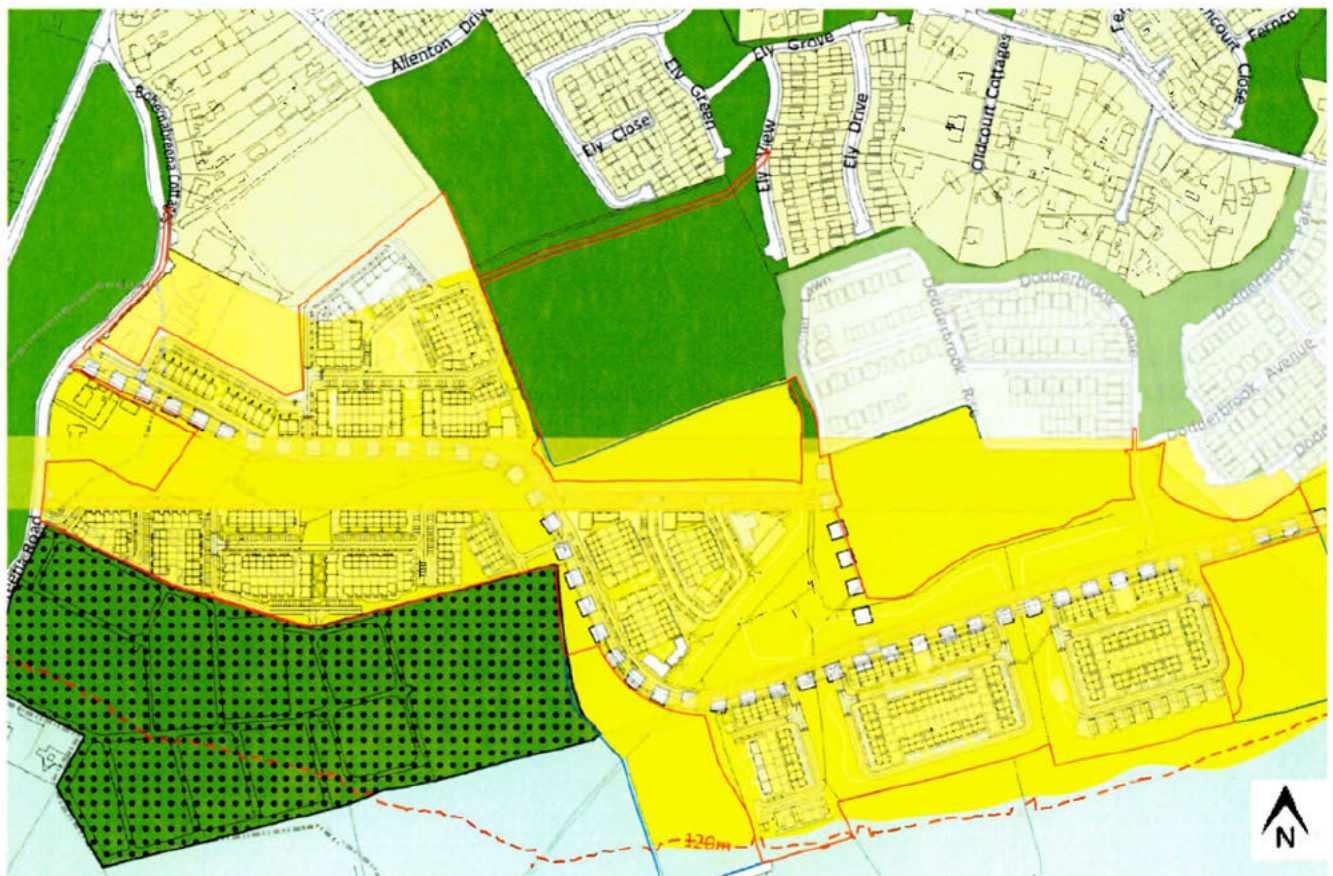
Proposed development i.e. site layout plan & red line of LRD application overlaid on extract of Map 9 of the existing CDP illustrating the "RES-N", "RES" and "RU" Land-Use Zoning Objectives attached to the application site.
